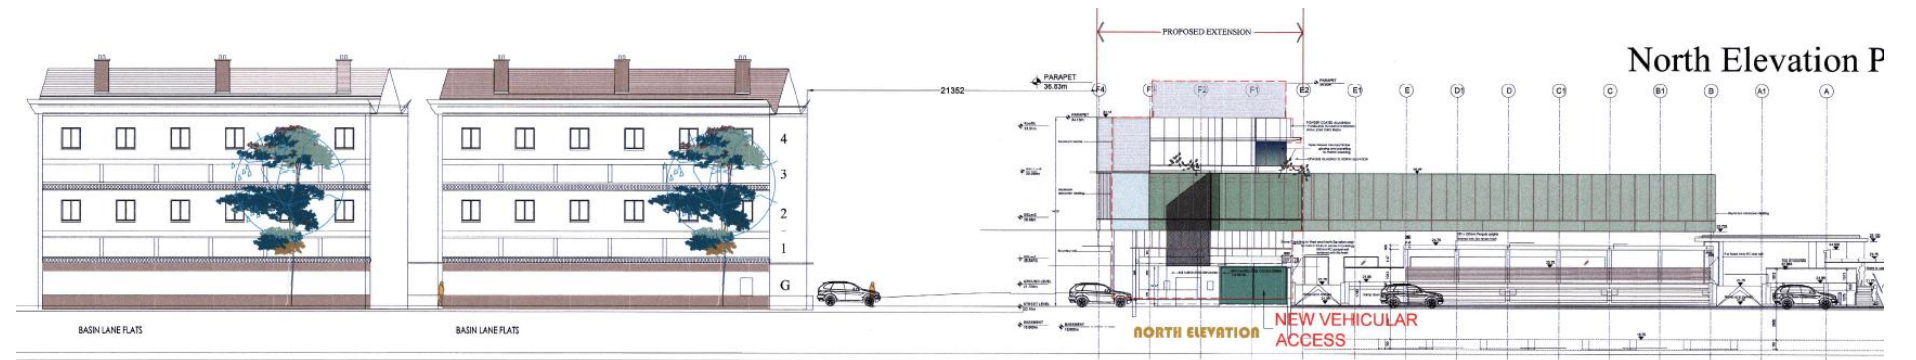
extract from 'Contextual North Elevation Proposed' from application drawings by Eoin Condon Architect
